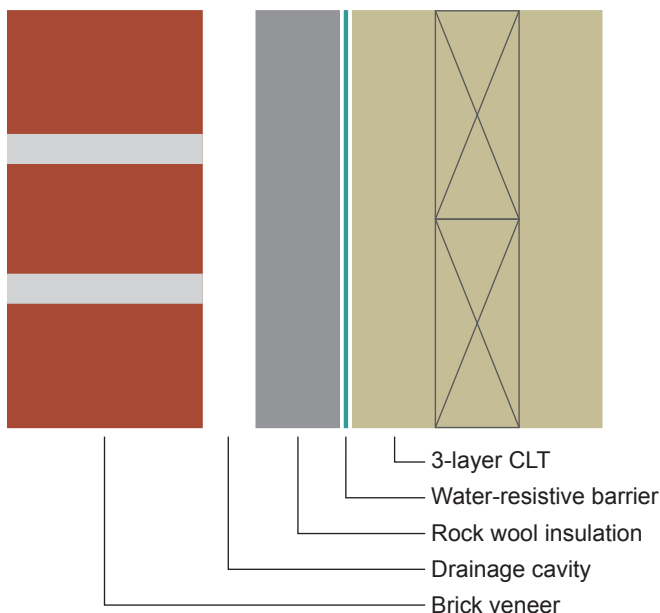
Illustration of the material layers in an example CLT exterior wall.
